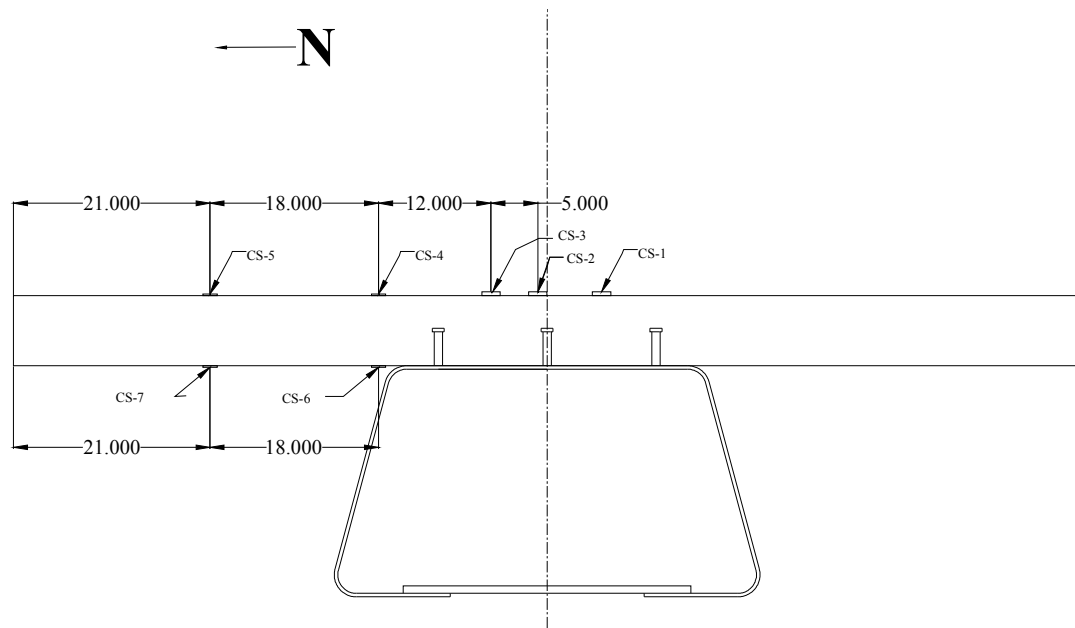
CONCRETE SURFACE GAGE LOCATIONS
